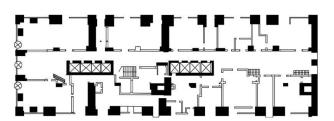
Monadnock building's ground floors shows its thick walls (URL 4)
